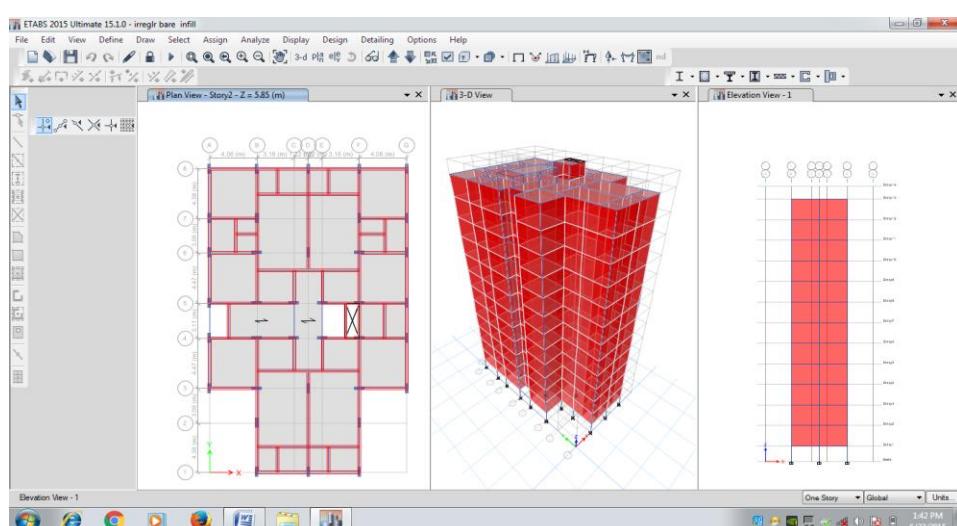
Plan, 3D model and Elevation of bare frame with infill wall for irregular plan
